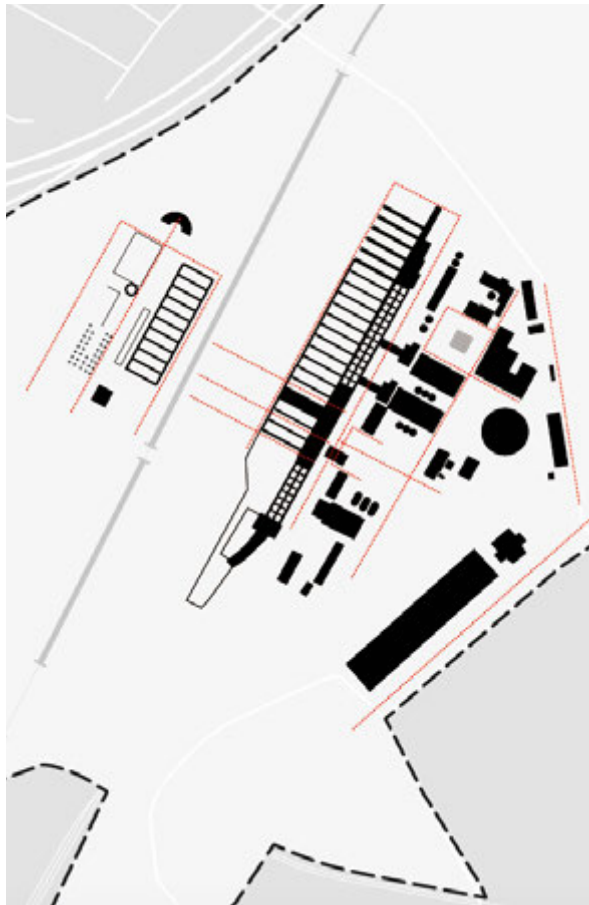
Plan geometries Steelworks area. (Drawing: Jan Wilbers).
